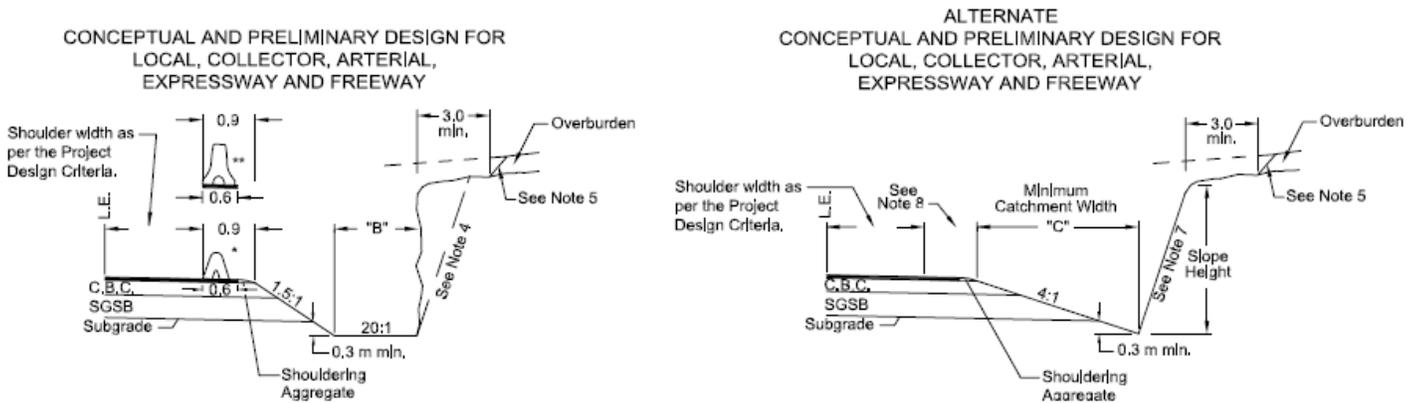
Rock Cut Typical Section - Excerpt from BC Supplement to TAC Geometric Design Guidelines
